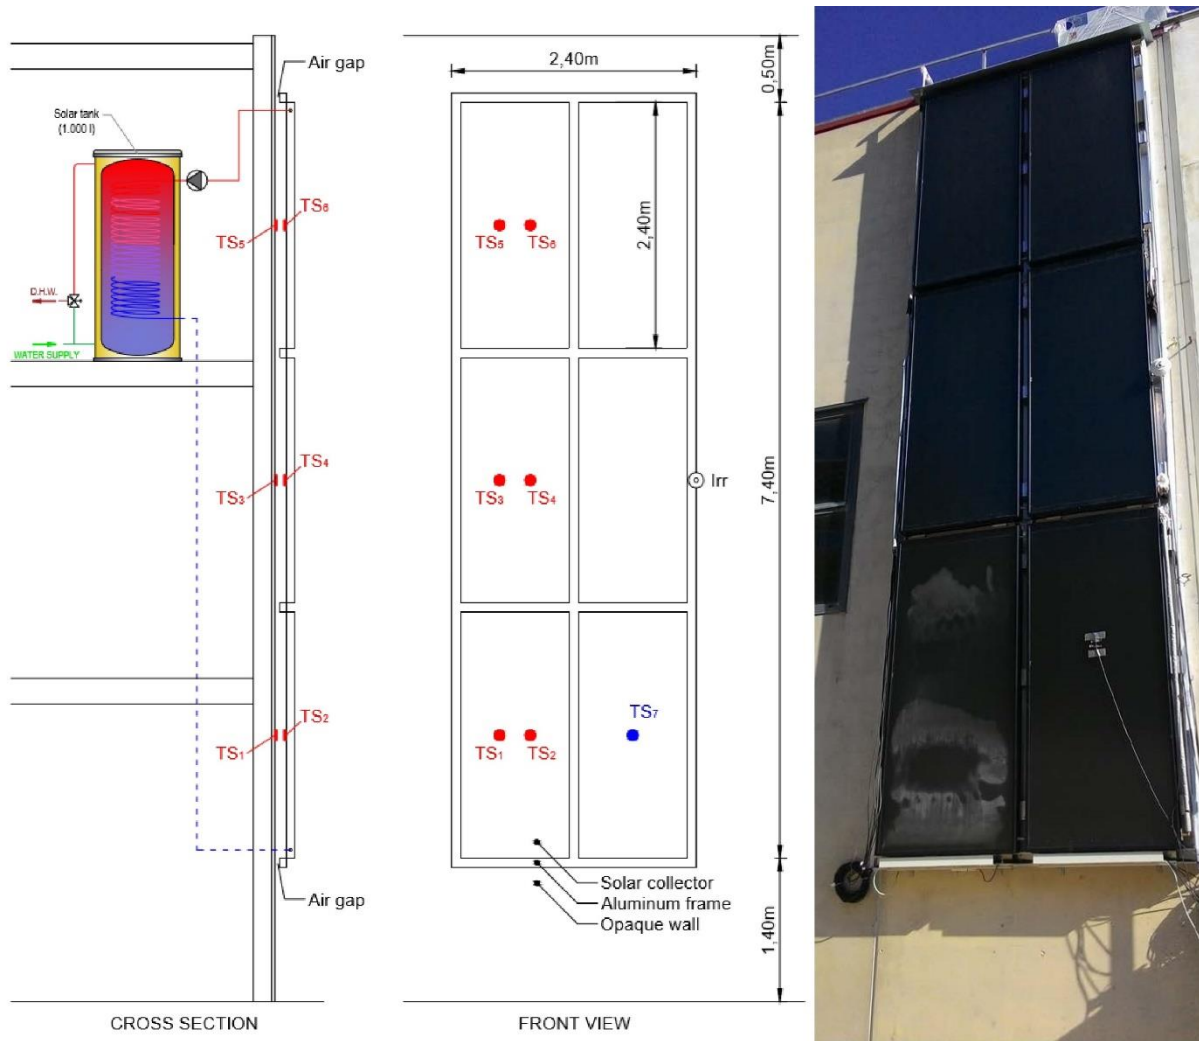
Section and front view of the v-BSTF façade with the installed sensors
